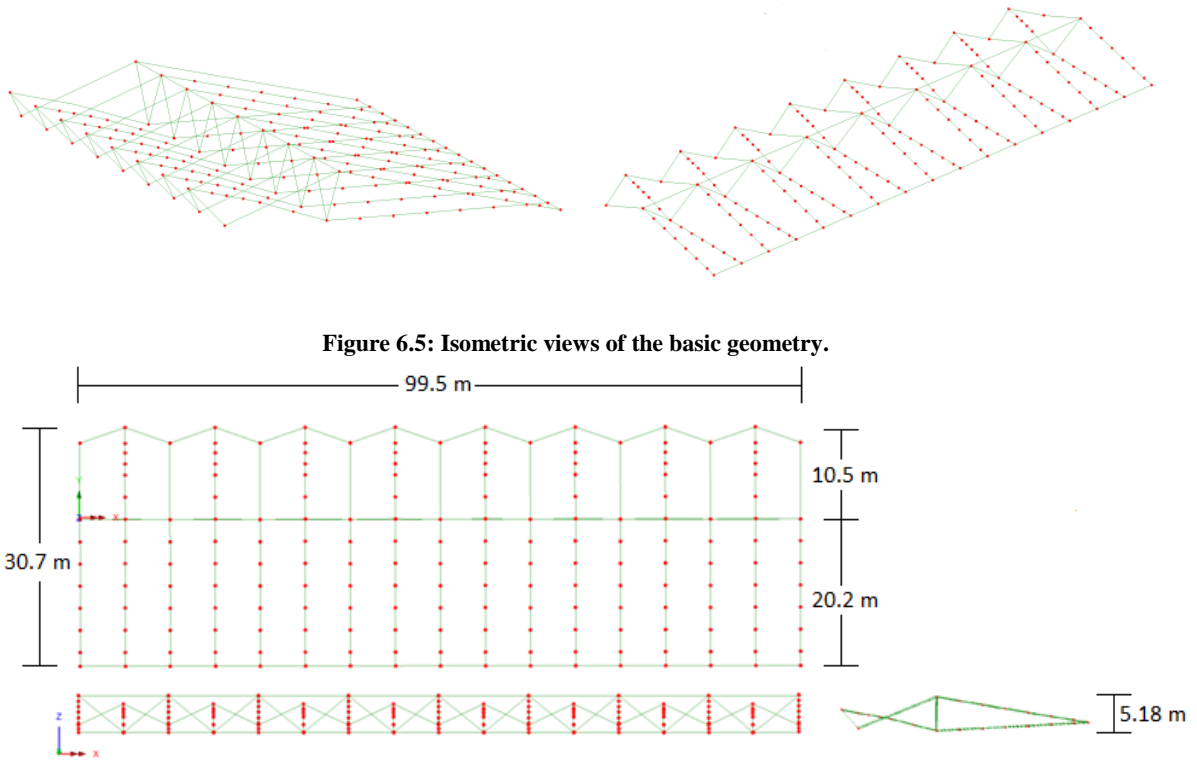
Plan and elevation dimensions of the basic geometry.
